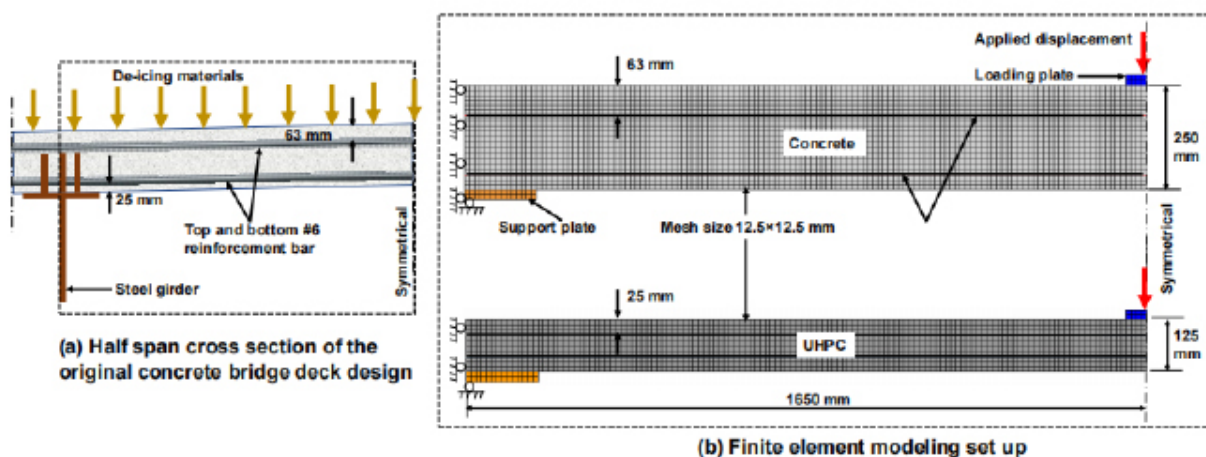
Concrete bridge deck and the finite element modeling (FEM) set up.
